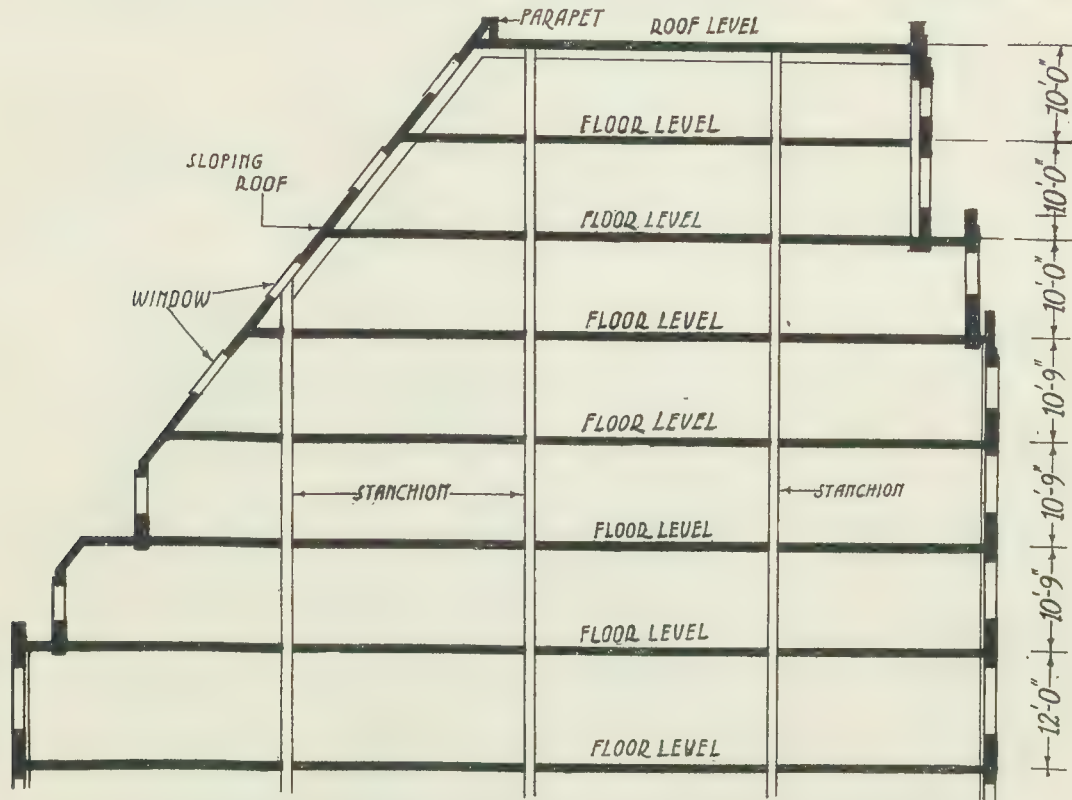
SECTION THROUGH A DECK ROOF CONTAINING SEVERAL FLOORS
